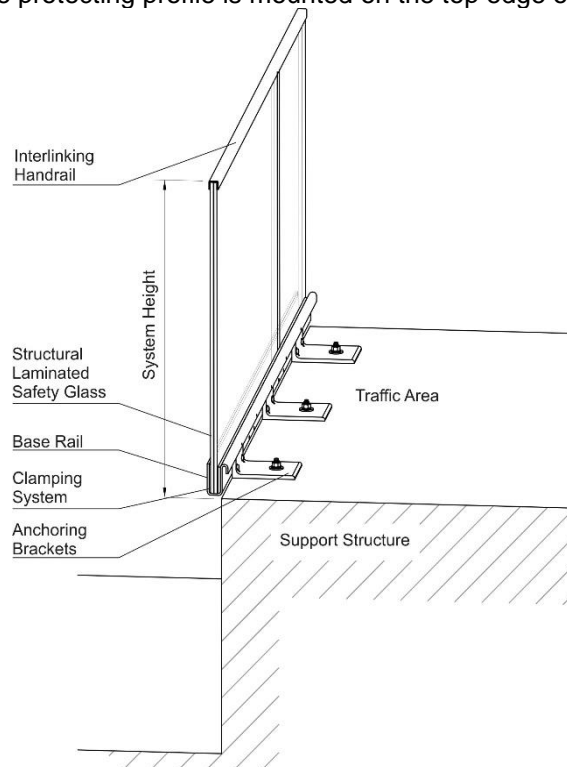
Drawing of Cantilevered structural glass railing/balustrade (example)
